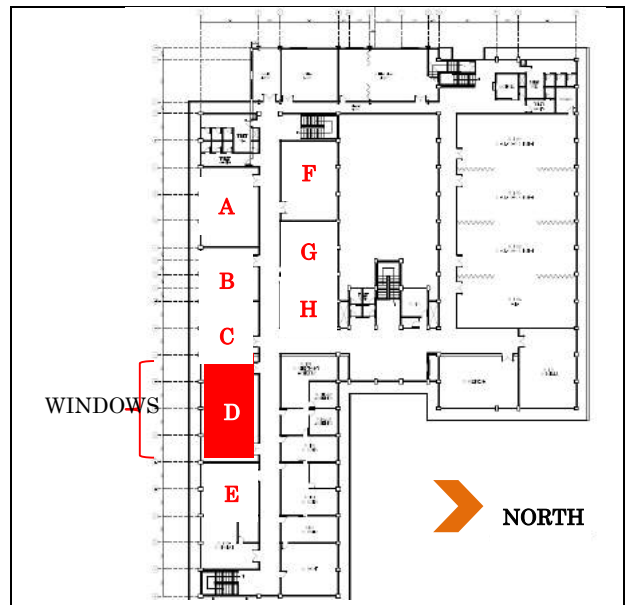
Layout of the room in the building. Studio classroom 'D' as a study case represent the other studio. The studio classroom located in the fourth floor which is the top floor of Engineering building.
